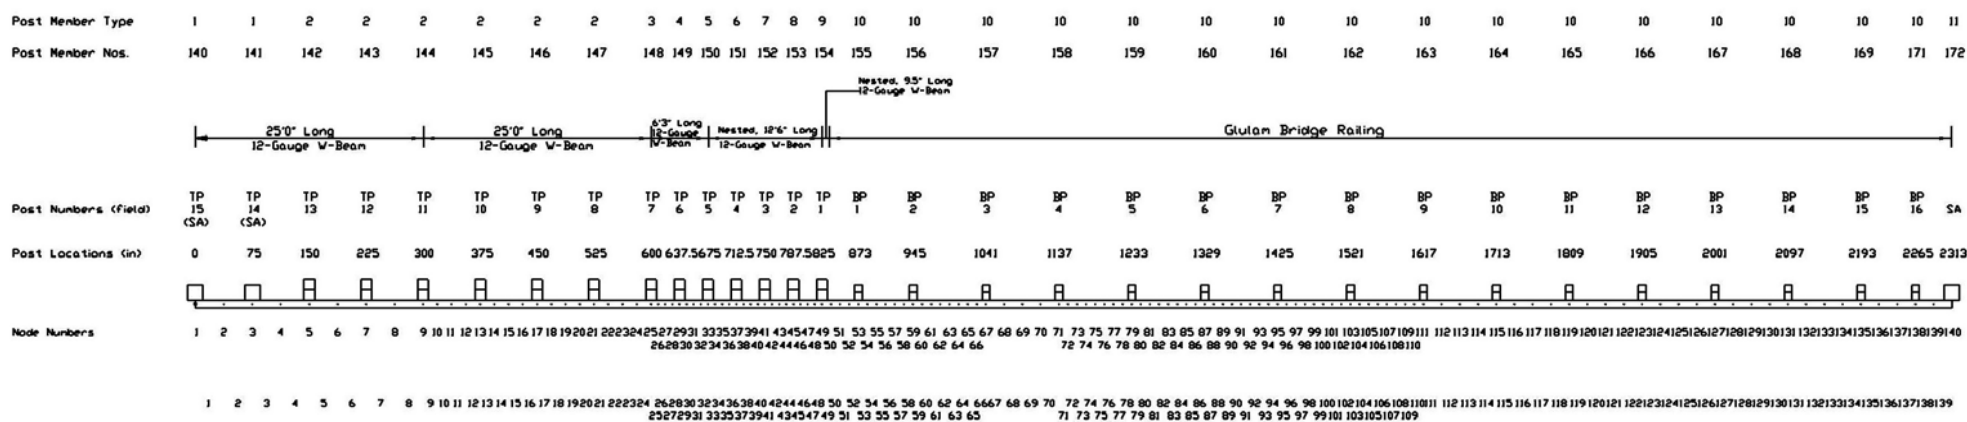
Model of the Wood Bridge Railing and Approach Guardrail System Attached to the Wood Bridge Railing
